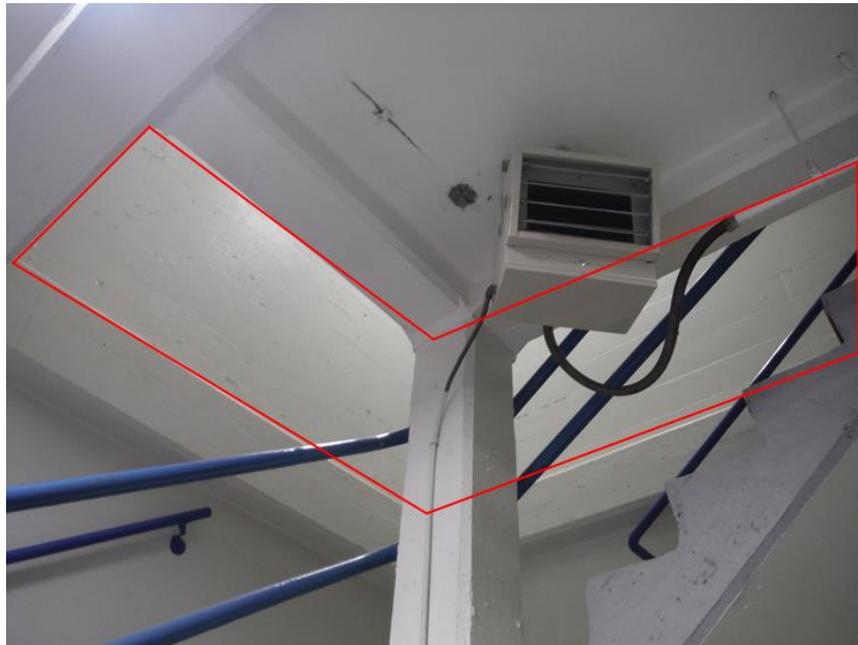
Large Diaphragm Opening Adjacent to Shear Walls
